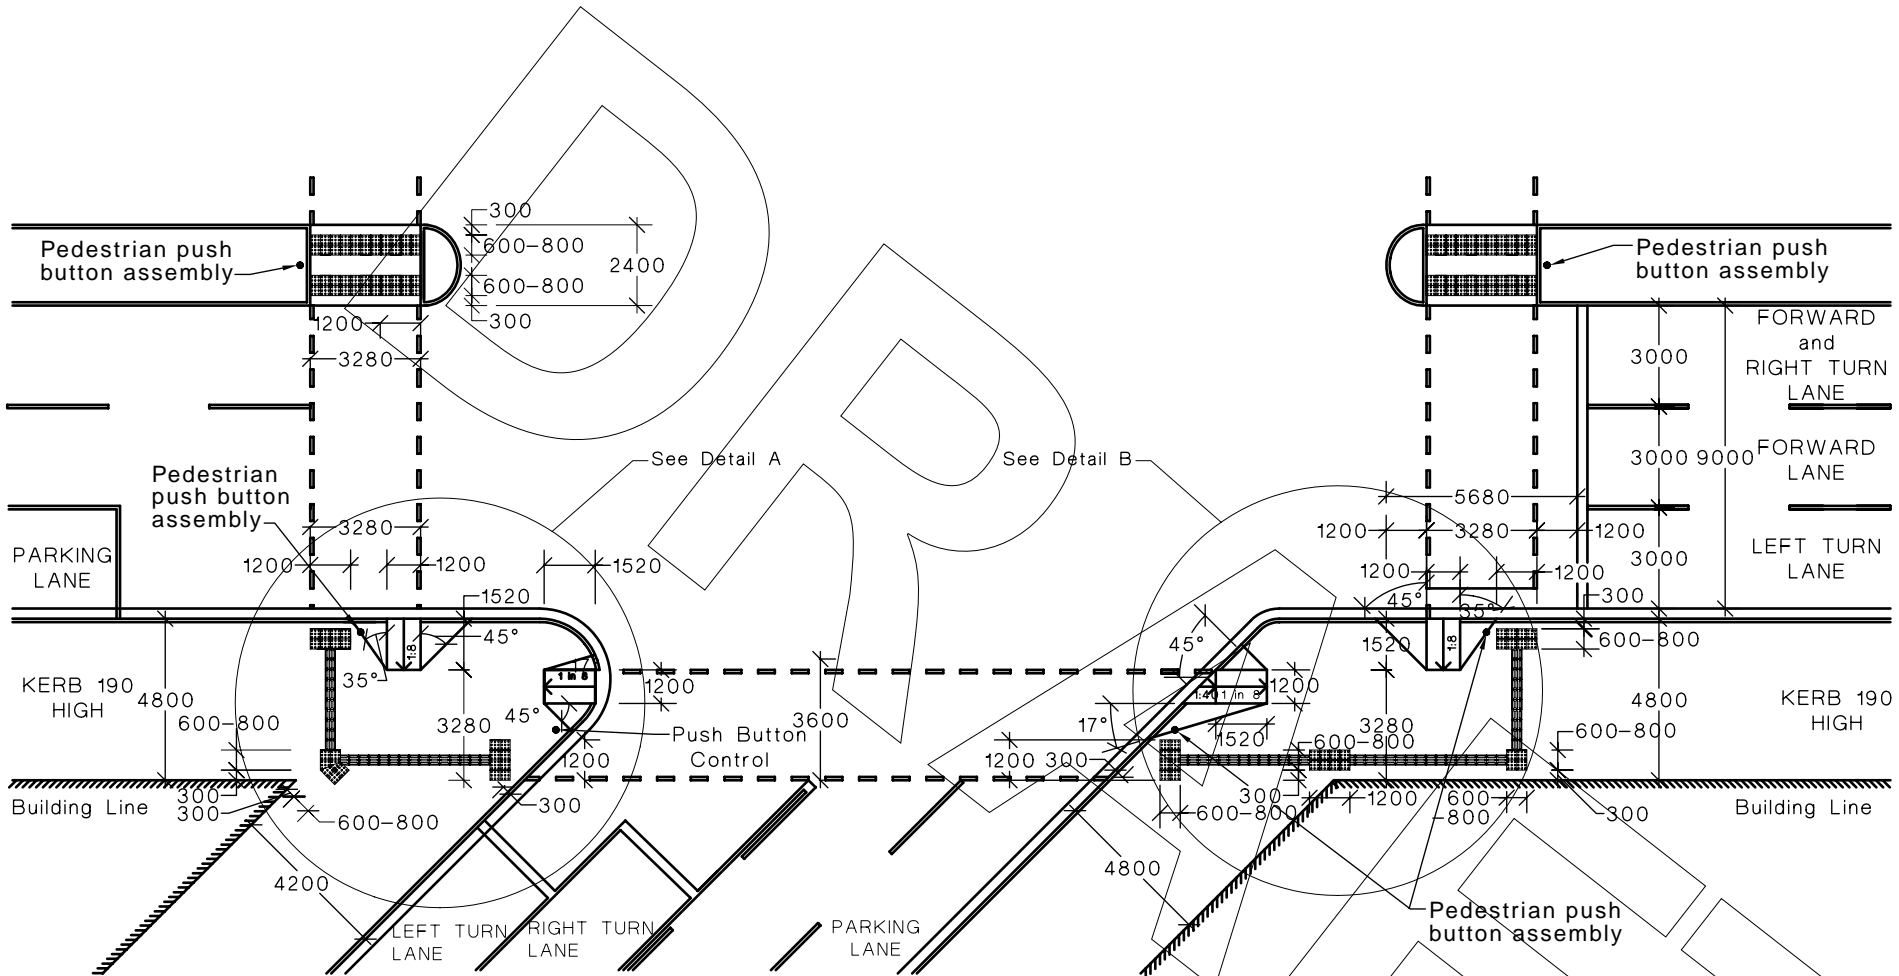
(in part) RIGHT ANGLE INTERSECTION, DUAL SEPARATE ENTRY CROSSING POINTS, LOWERED KERB—90° 1:8 KERB RAMPS, FOOTPATH WIDTH LESS THAN 3000
